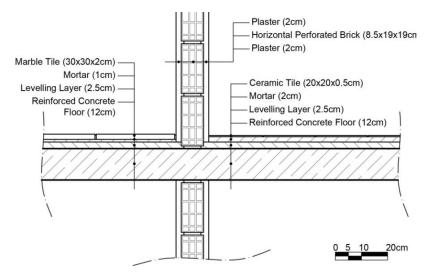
First Floor Interior Wall II: Between Office Room and Restroom
